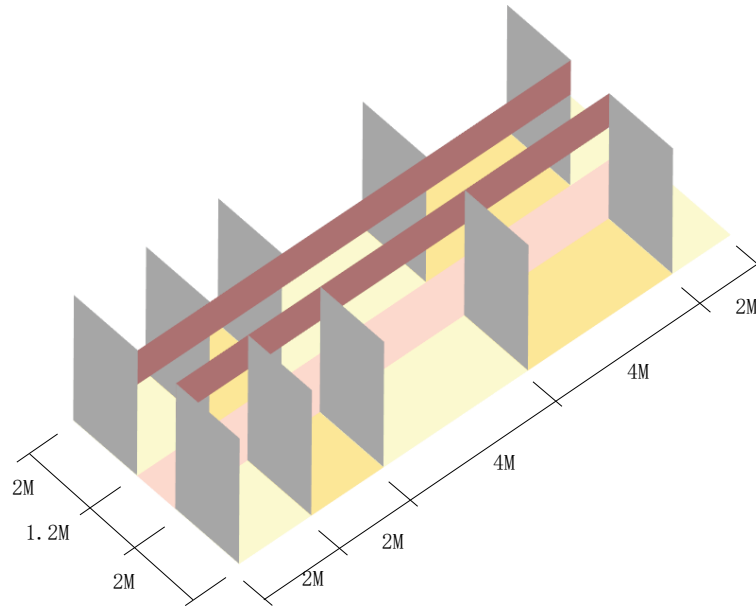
Typical Stall Layout in Guangfunan Wholesale Spaces (Source: Author)
